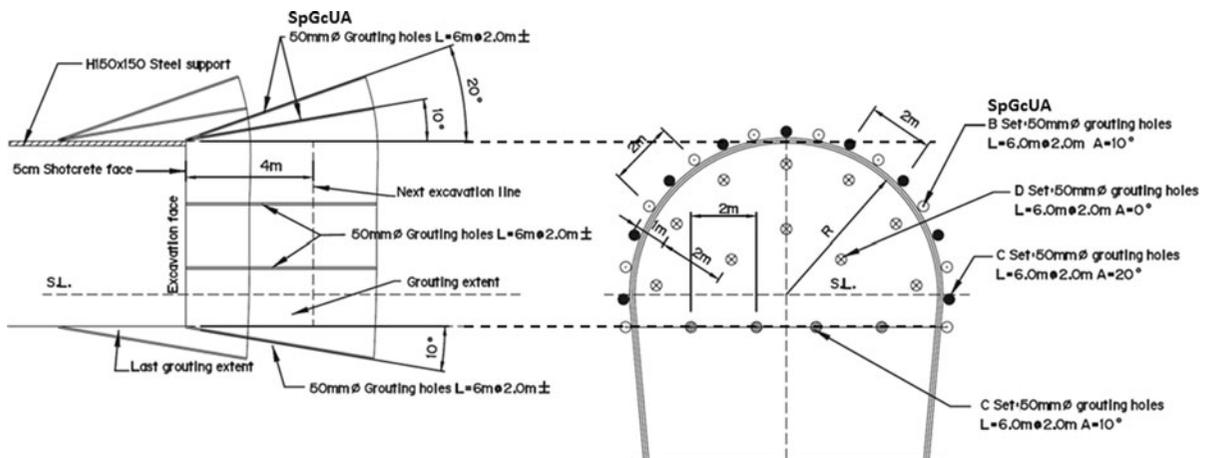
Cross sections of the SpGcUA Kukan Tailrace hydropower plants tunnel (modified after Liu et al. 2010)
